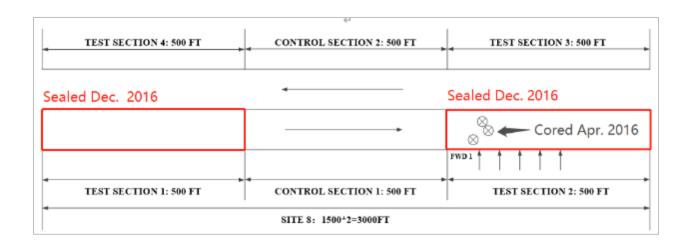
Graph. Sealed Sections and First Coring Locations at Site 8
